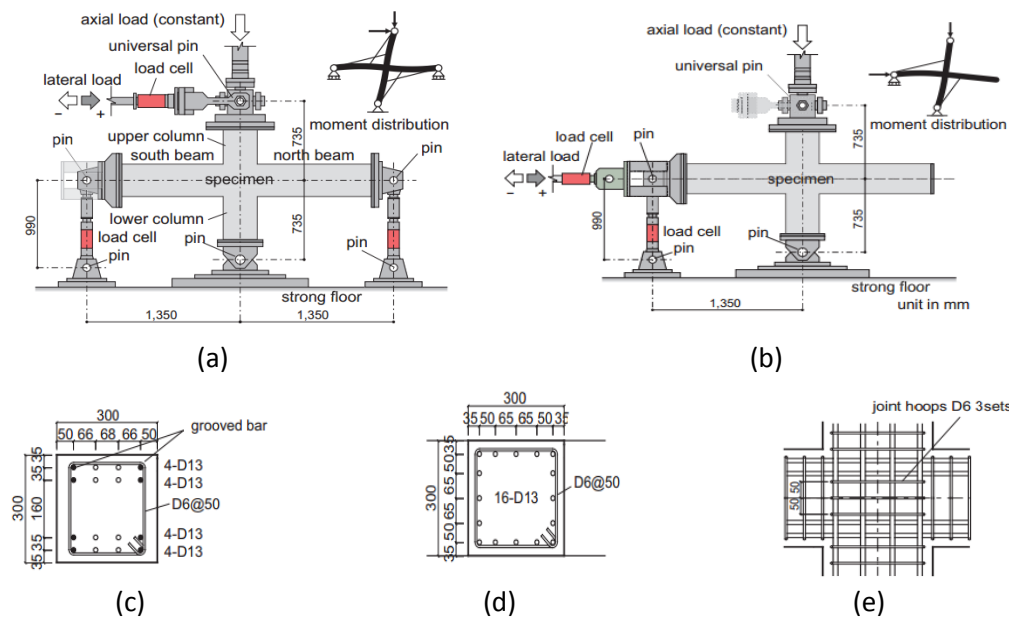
Beam-Column joints. Geometry of (a) A1 and (b) A3 specimens, and reinforcement details of the (c) beam, (d) column and (e) joint section. [8]
